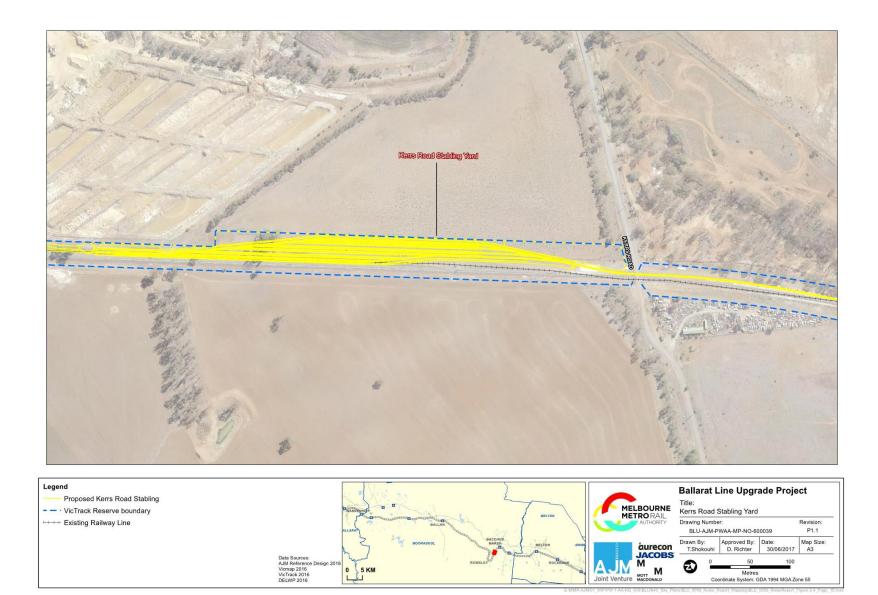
KERRS ROAD DISTRICT: LOCATION OF MADDINGLEY STABLING YARD
